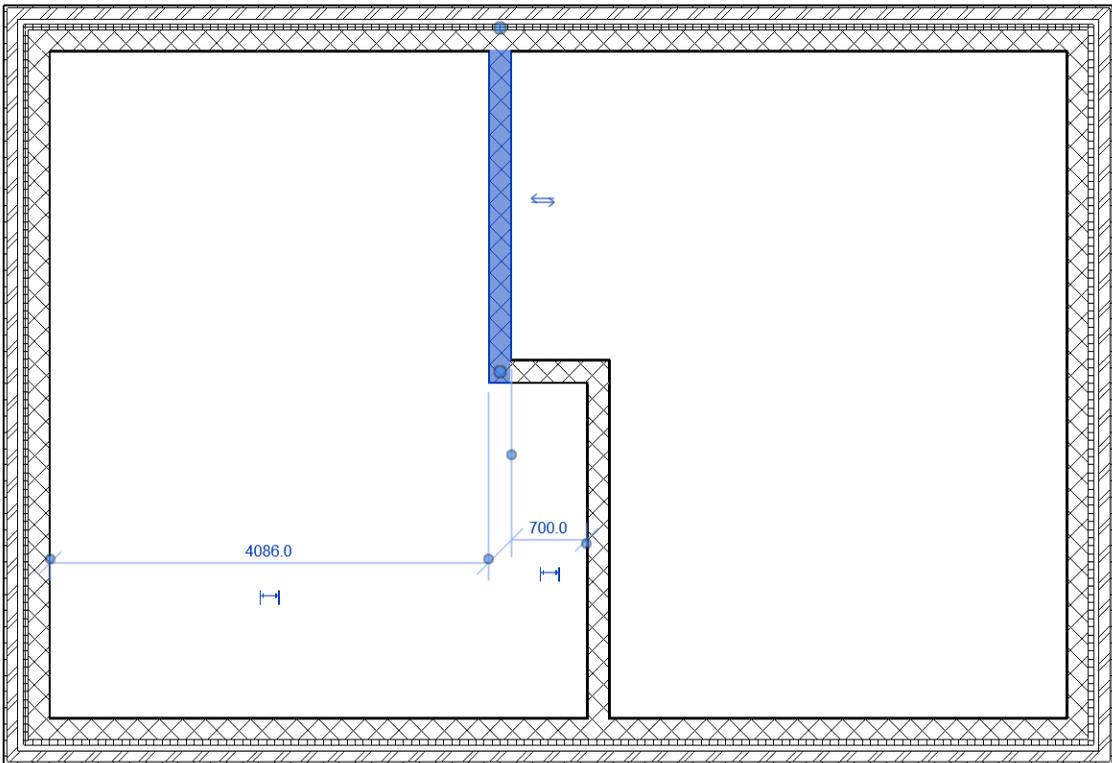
The internal wall is a single, continuous structure but in BIM each segment may be represented as a distinct wall
